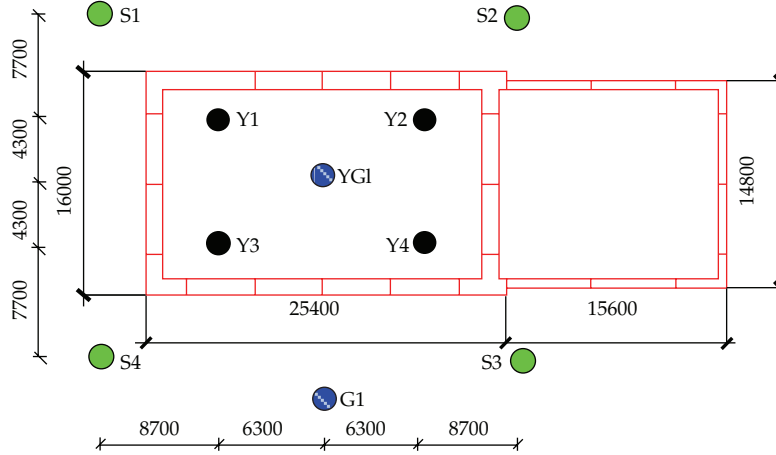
Dewatering wells distributed around southern airshaft excavation (unit: mm).
